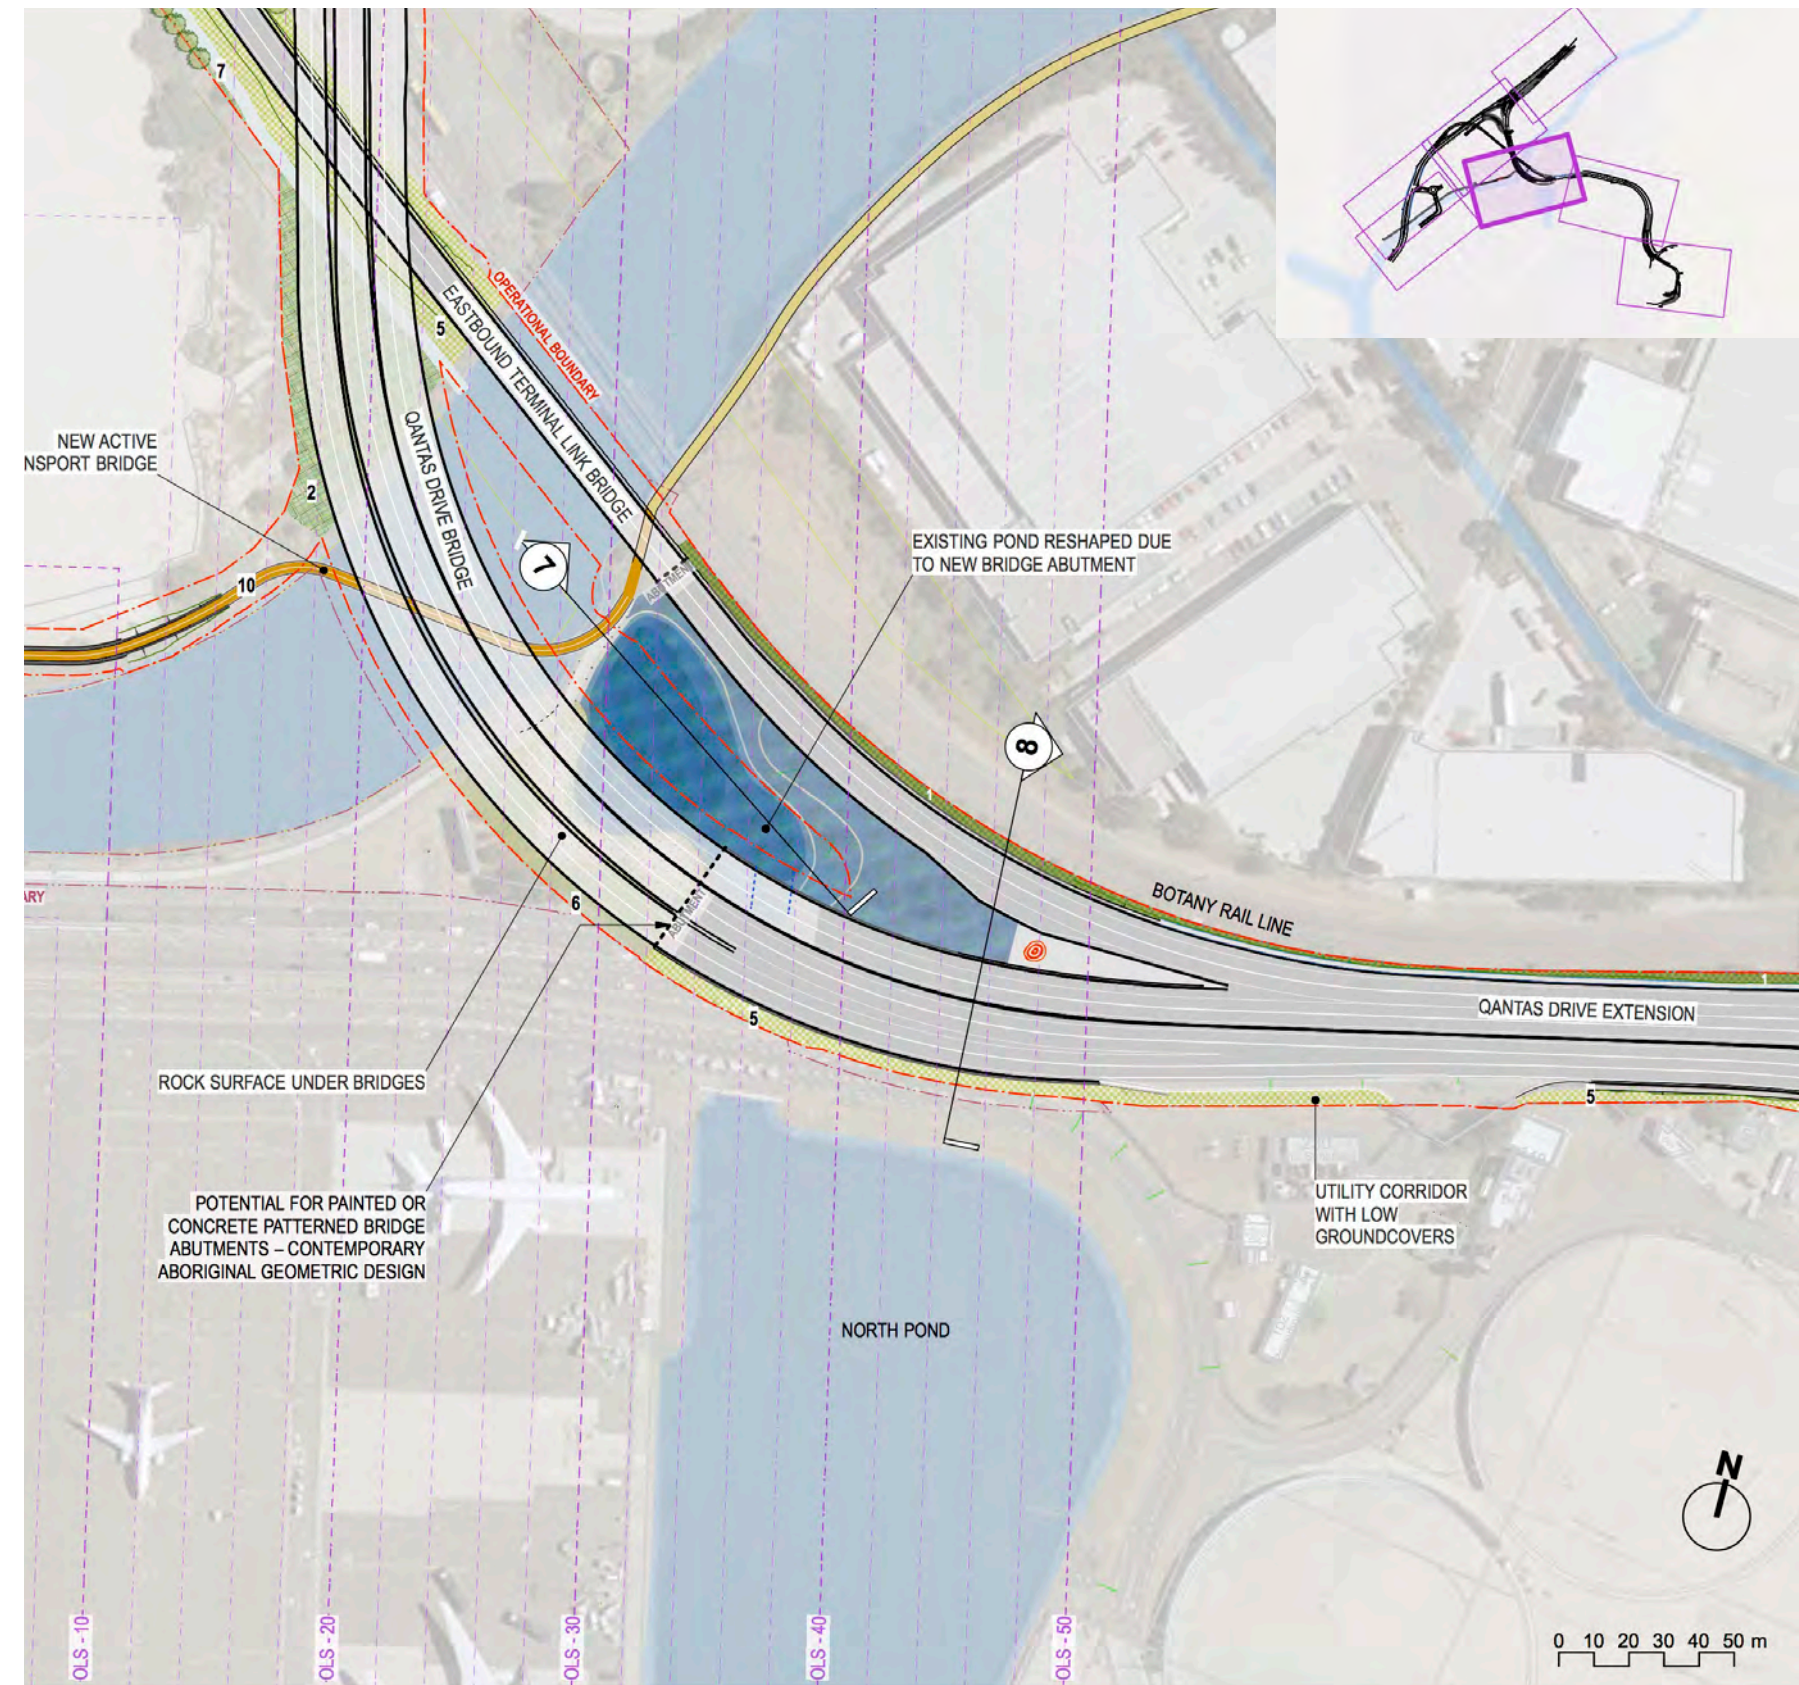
Urban and Landscape Design Concept plan – Precinct 5: Qantas Drive extension
